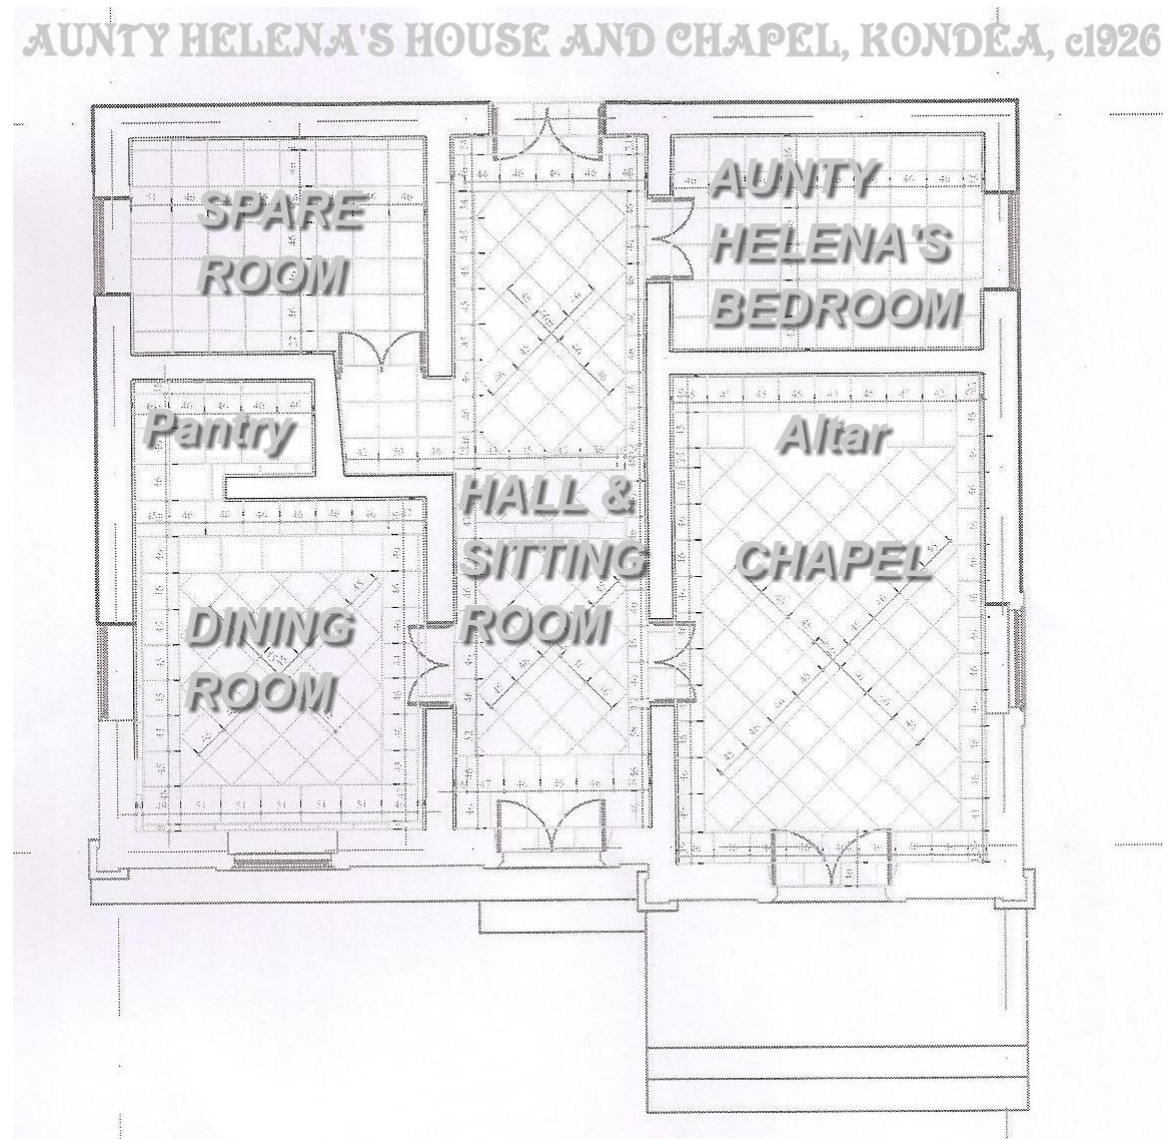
Aunty Helena's House and Family Chapel, Kondea, use of rooms c1926 (using the floor plan prepared by the Kontea Foundation)
